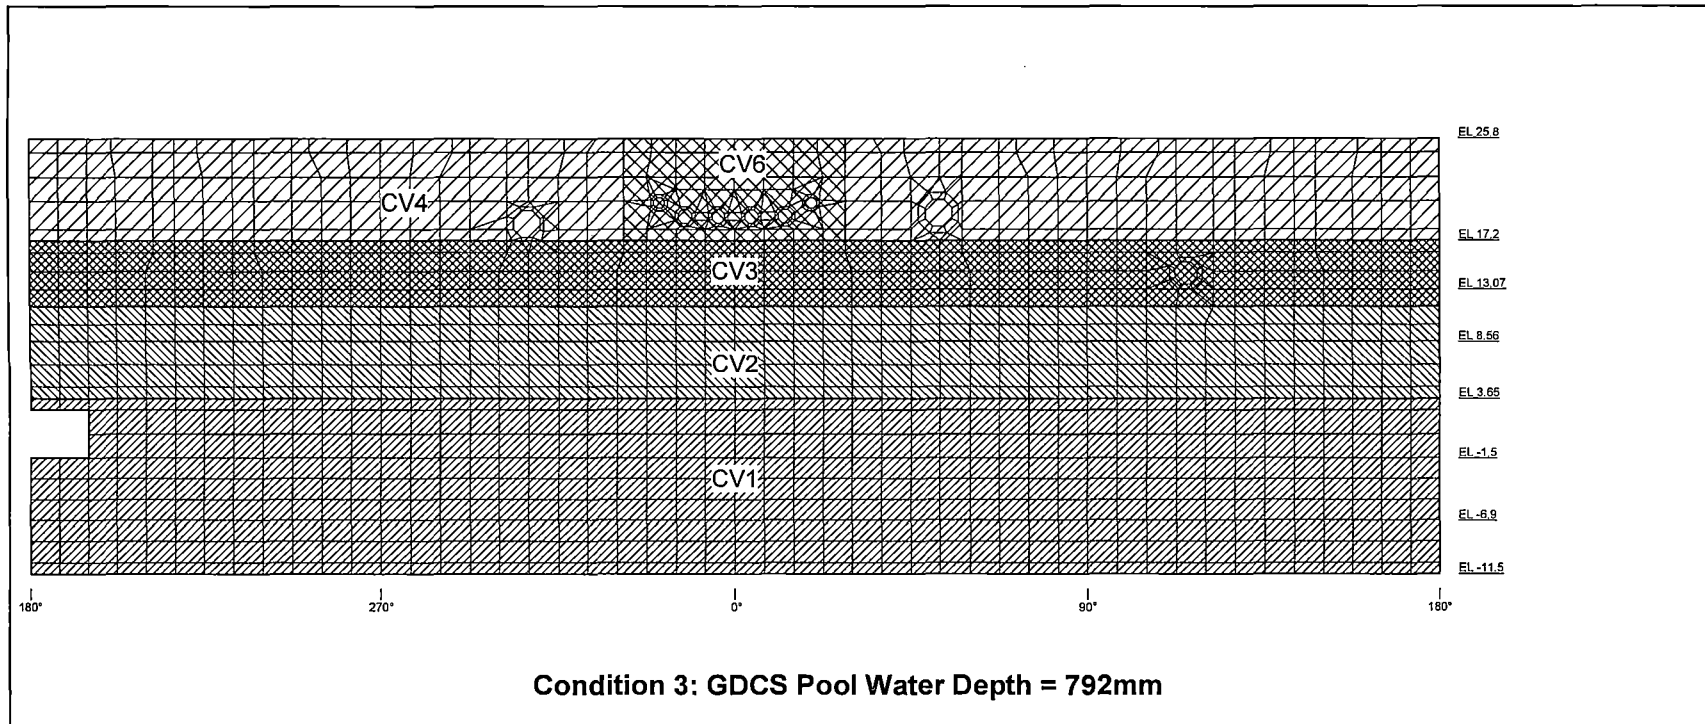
Application Thermal Load on the RCCV Wall (LOCA Flooding)
